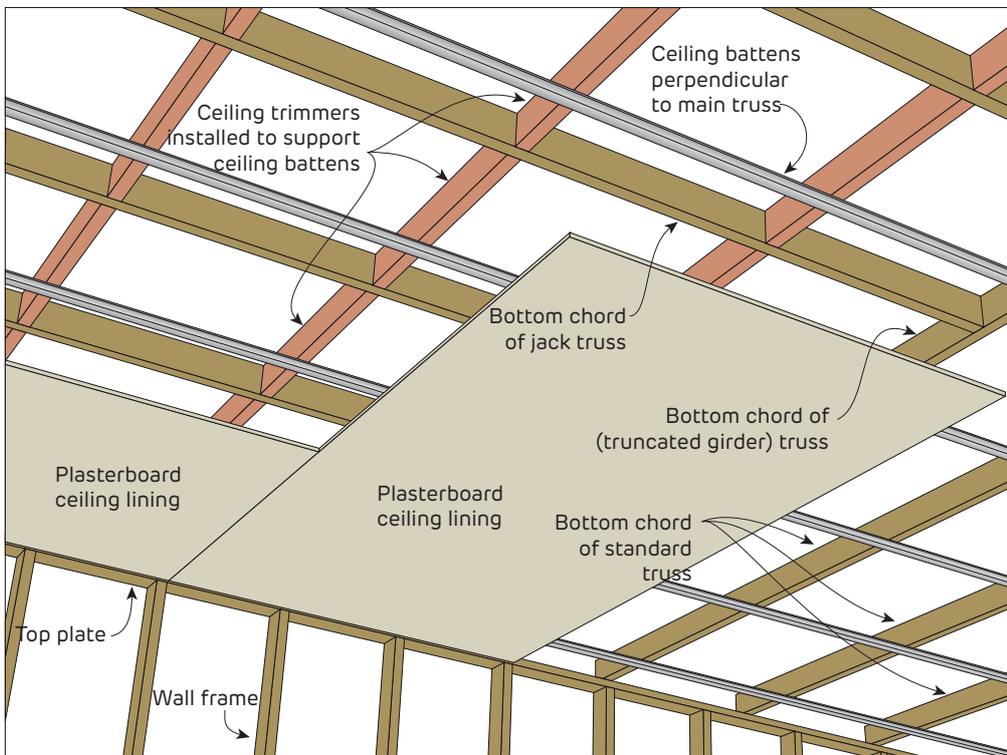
Trimmers to Support Ceiling Battens at Change of Truss Direction
